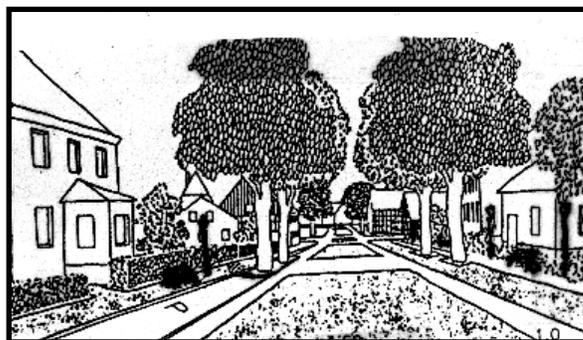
RENDERING TYPICAL STREET RIGHT-OF-WAY
